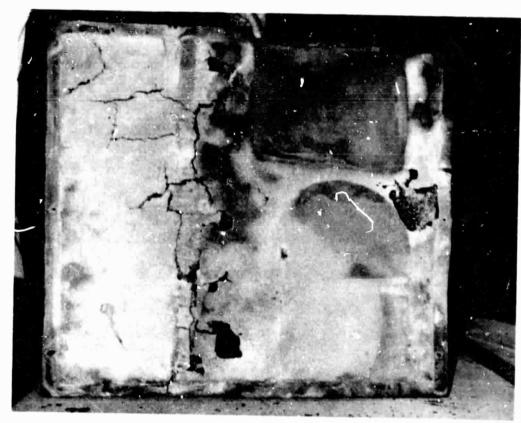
LEFT WALL OF MODULE B AND ADJACENT WALL
